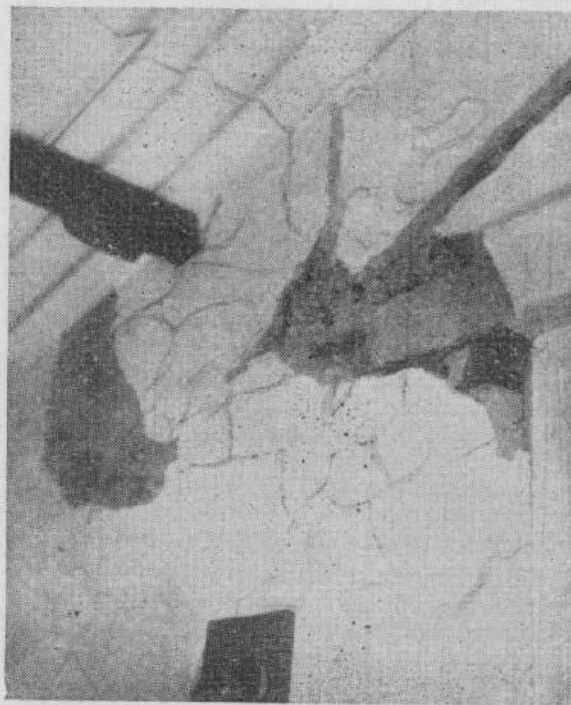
Bulging and damage of random rubble masonry wall at Shri V. R. Vinayagan's residence.
